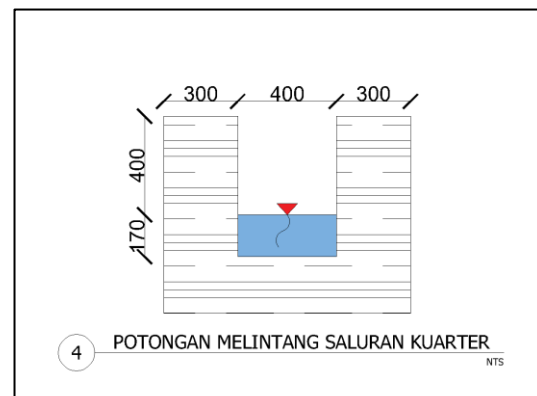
Cross-Section of Channel A Structural Reinforcement Plan
